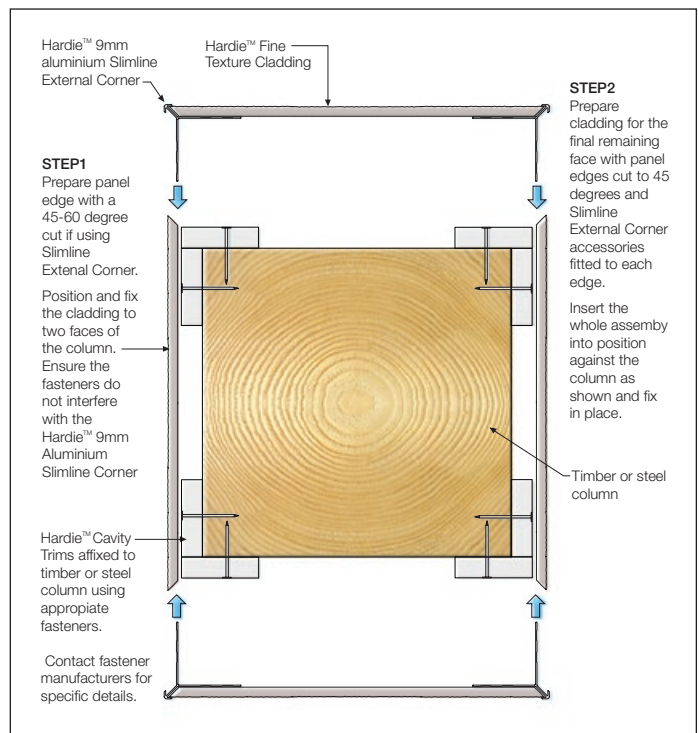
FIXING TO TIMBER OR STEEL COLUMN
